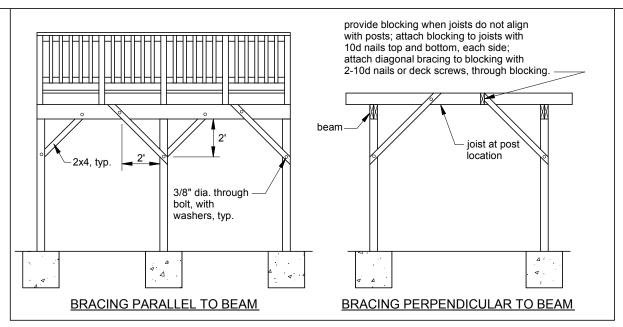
DIAGONAL BRACING REQUIREMENTS
